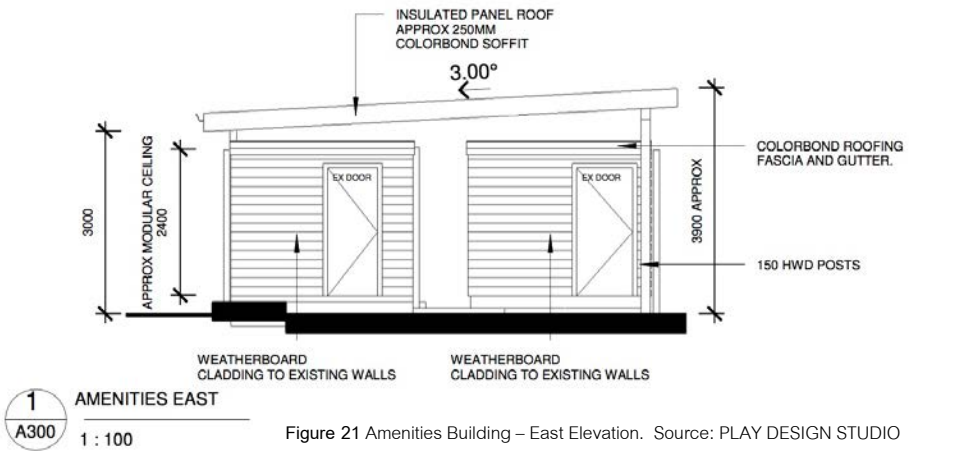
Amenities Building – East Elevation. Source: PLAY DESIGN STUDIO
